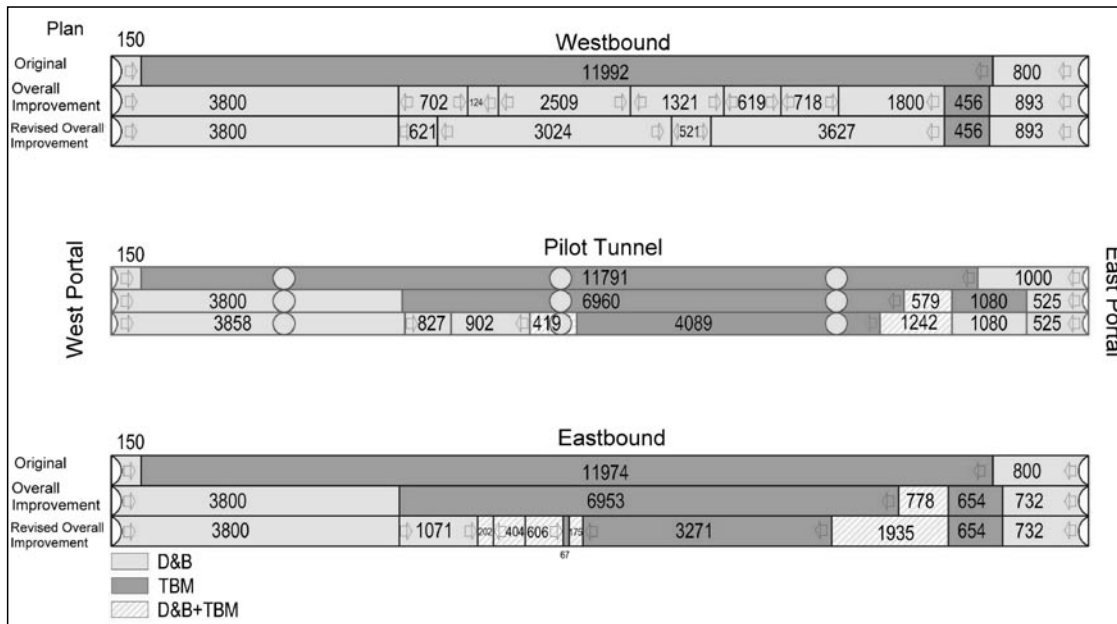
The Construction Plans for the Various Stages of the Hsuehshan Tunnel
